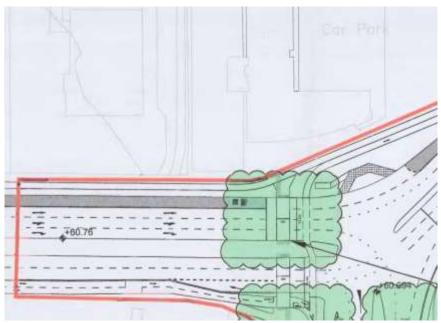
Extract from Proposed Site Layout Sheet 2 of 5 from Reg. Ref. SD21A/0291.
